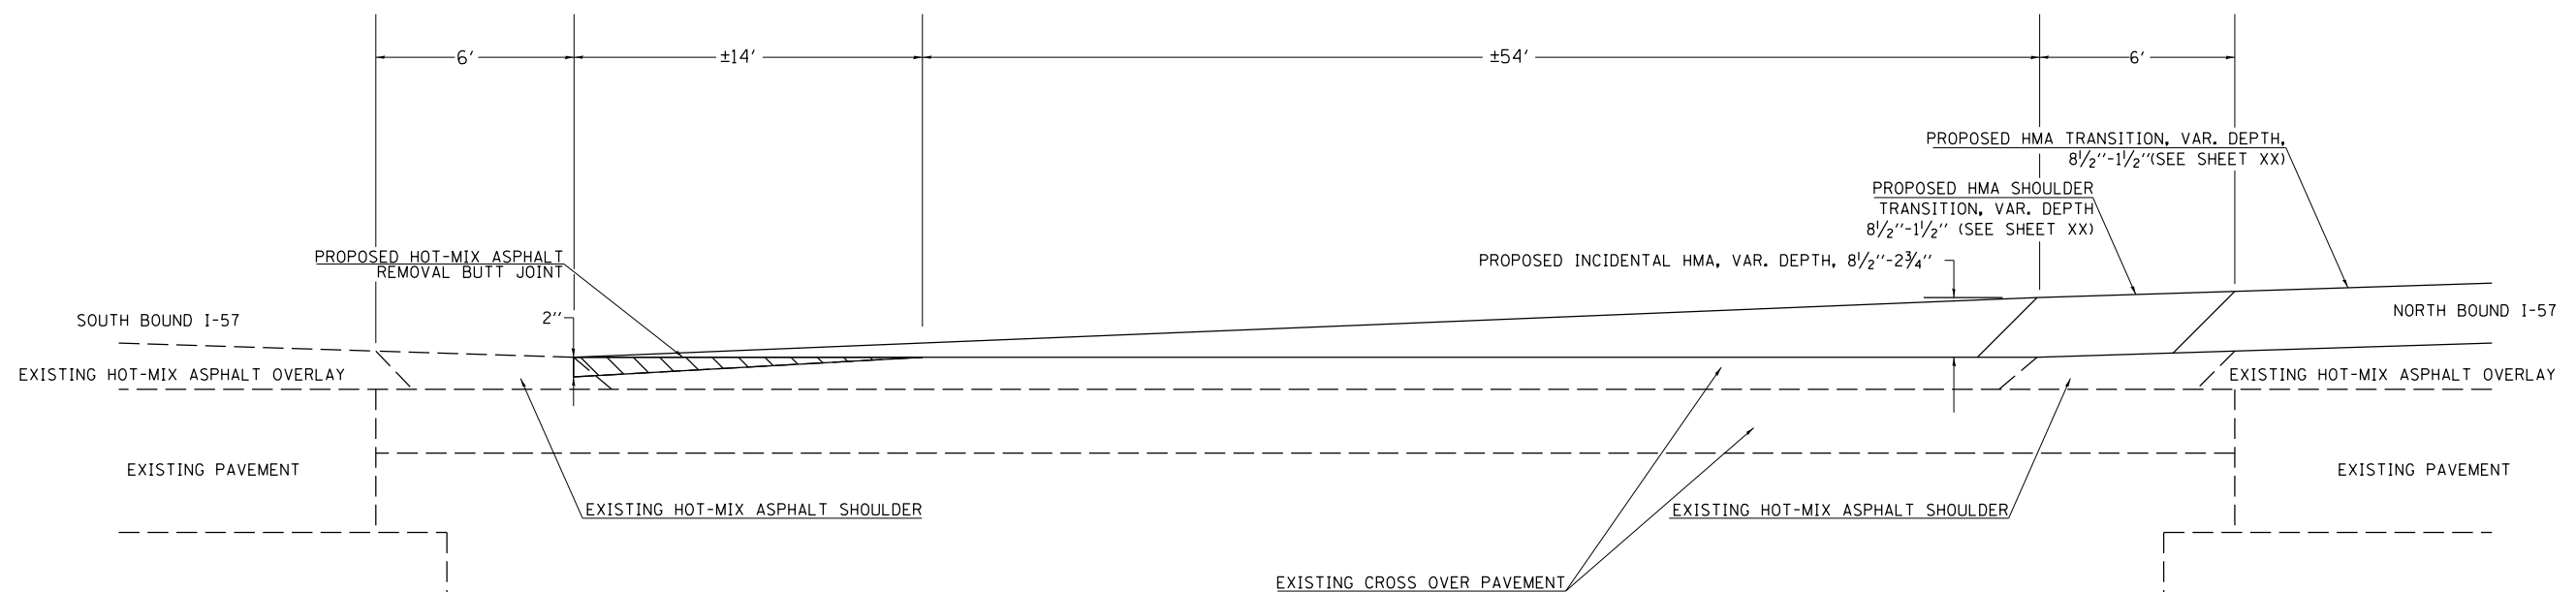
DETAIL OF MEDIAN CROSSOVER PLAN VIEW
